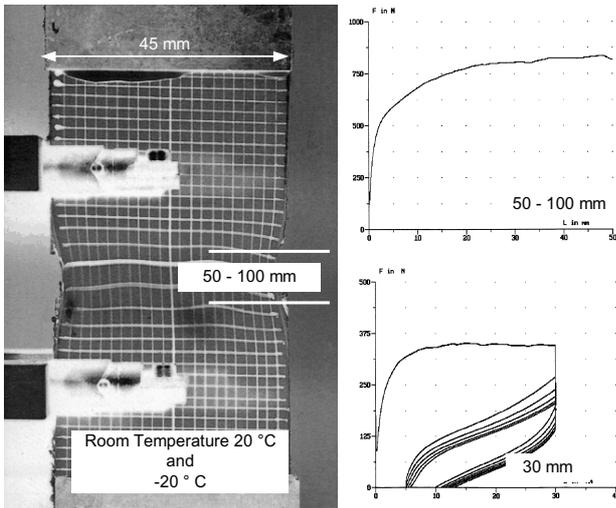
Static and cyclic crack bridging test of sealing membrane on concrete base
